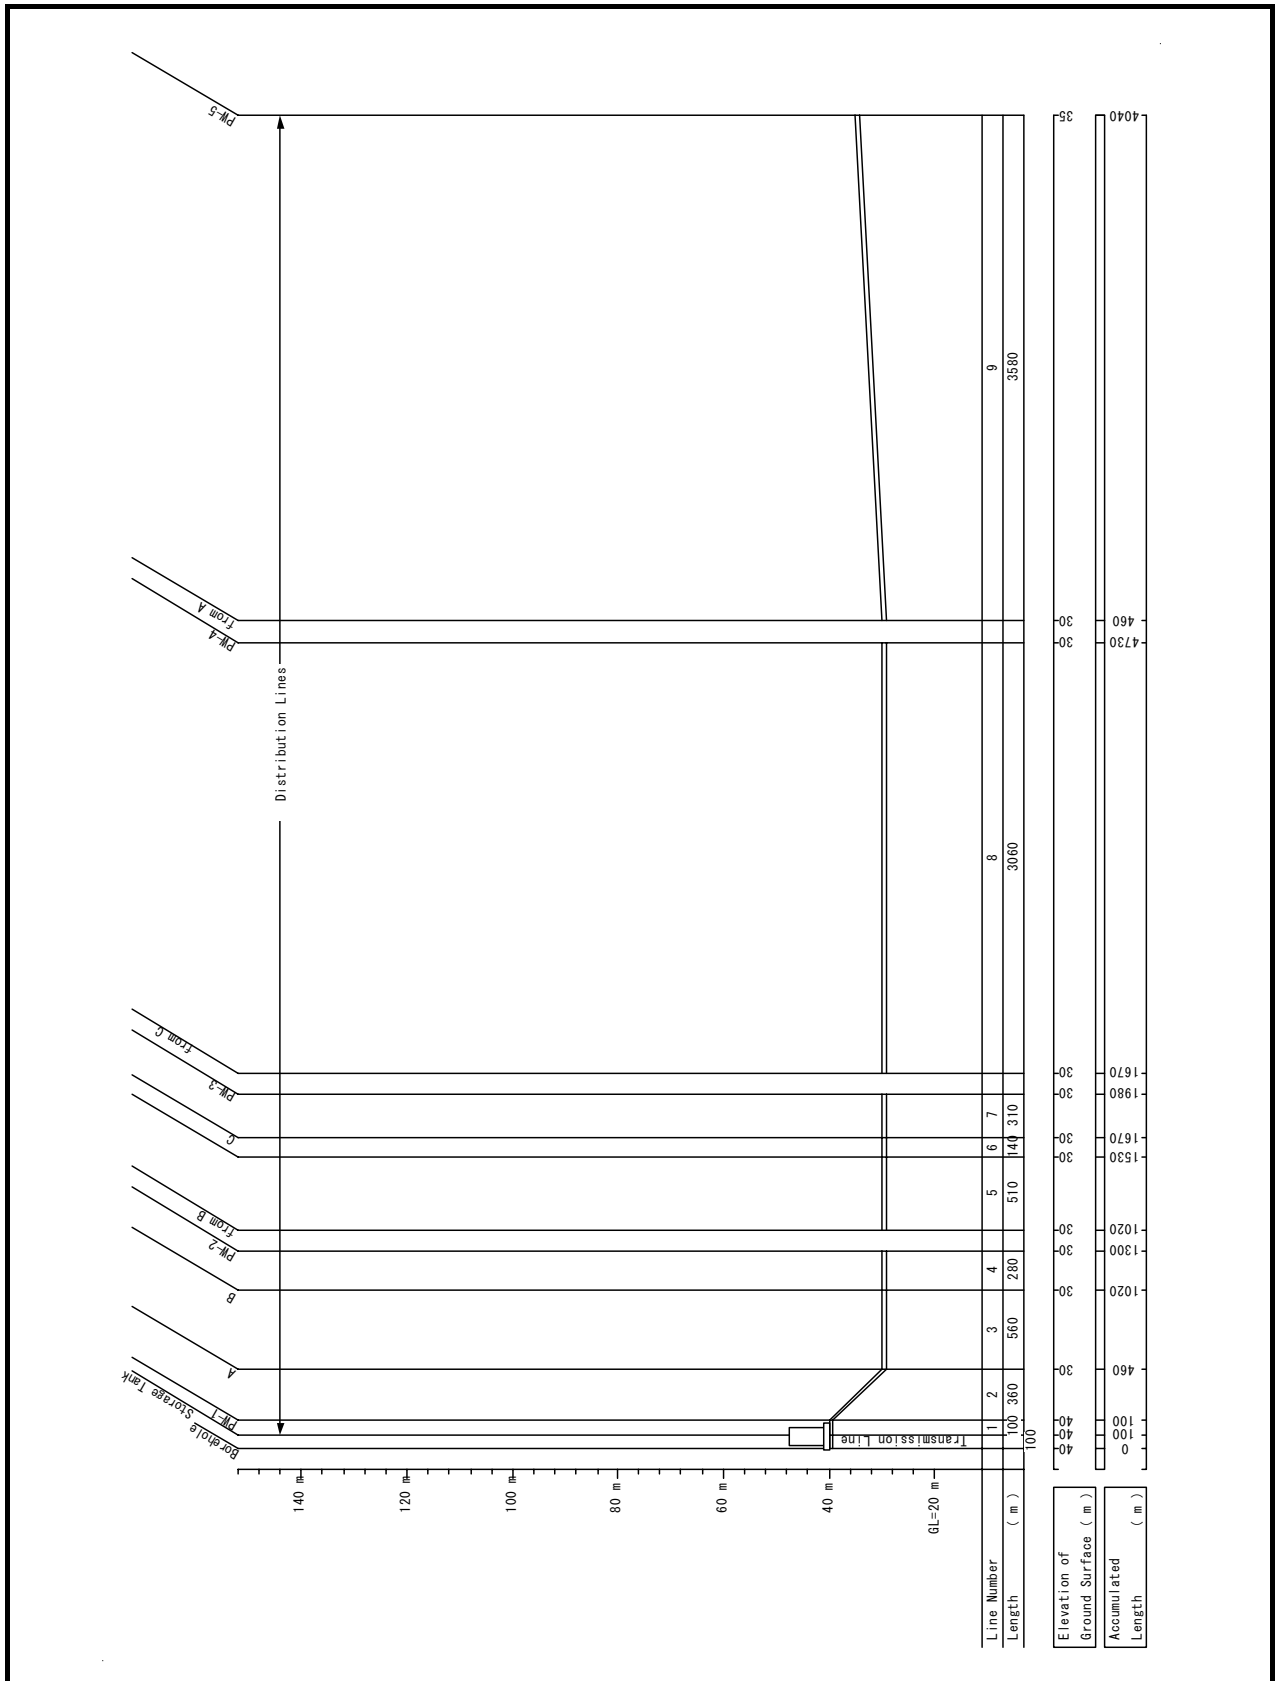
LONGITUDINAL SECTION ( NJOPEKA: 12/22(2))
